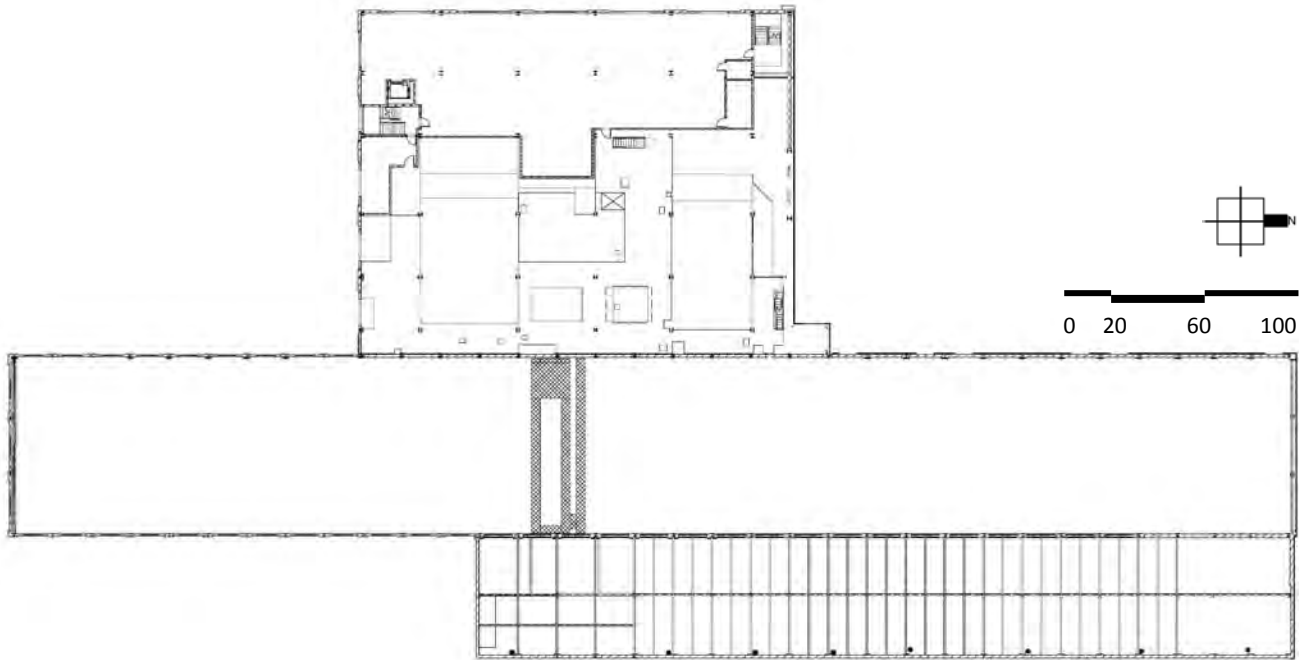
Fourth Floor Plan. Alley Poyner Macchietto Architecture, 2014.
